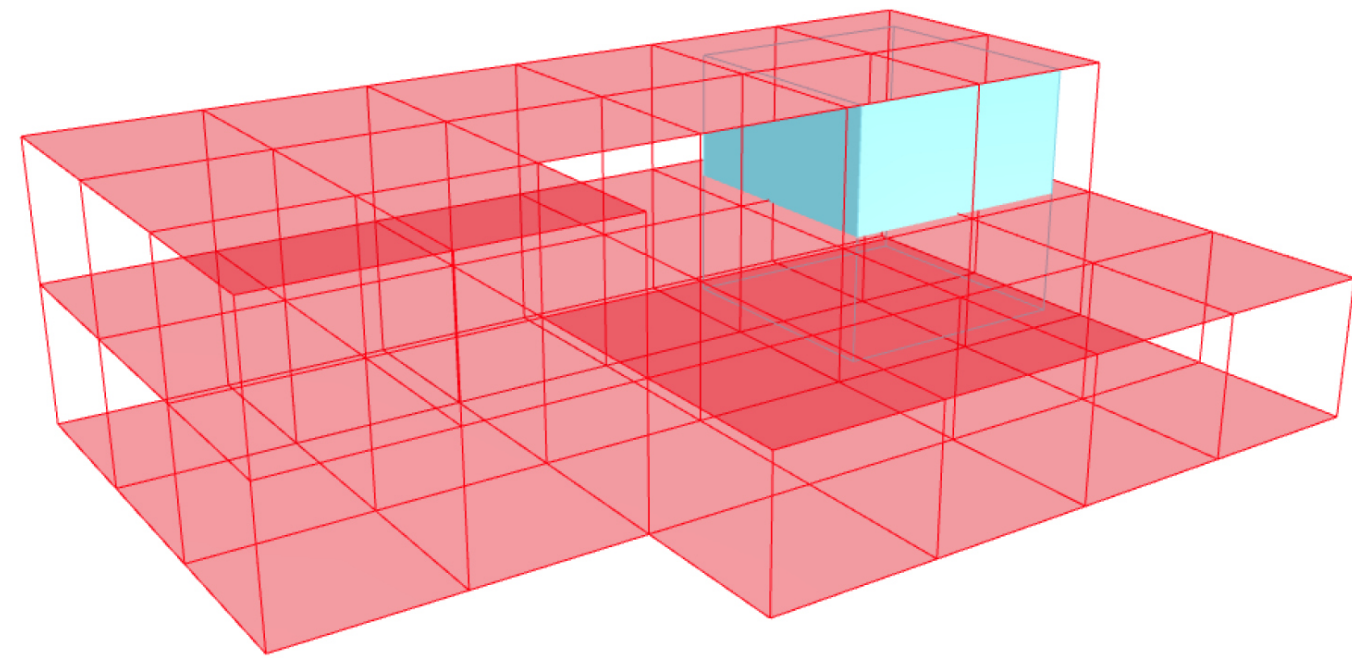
VIPP Chimney House (Studio David Thulstrup, 2019)
